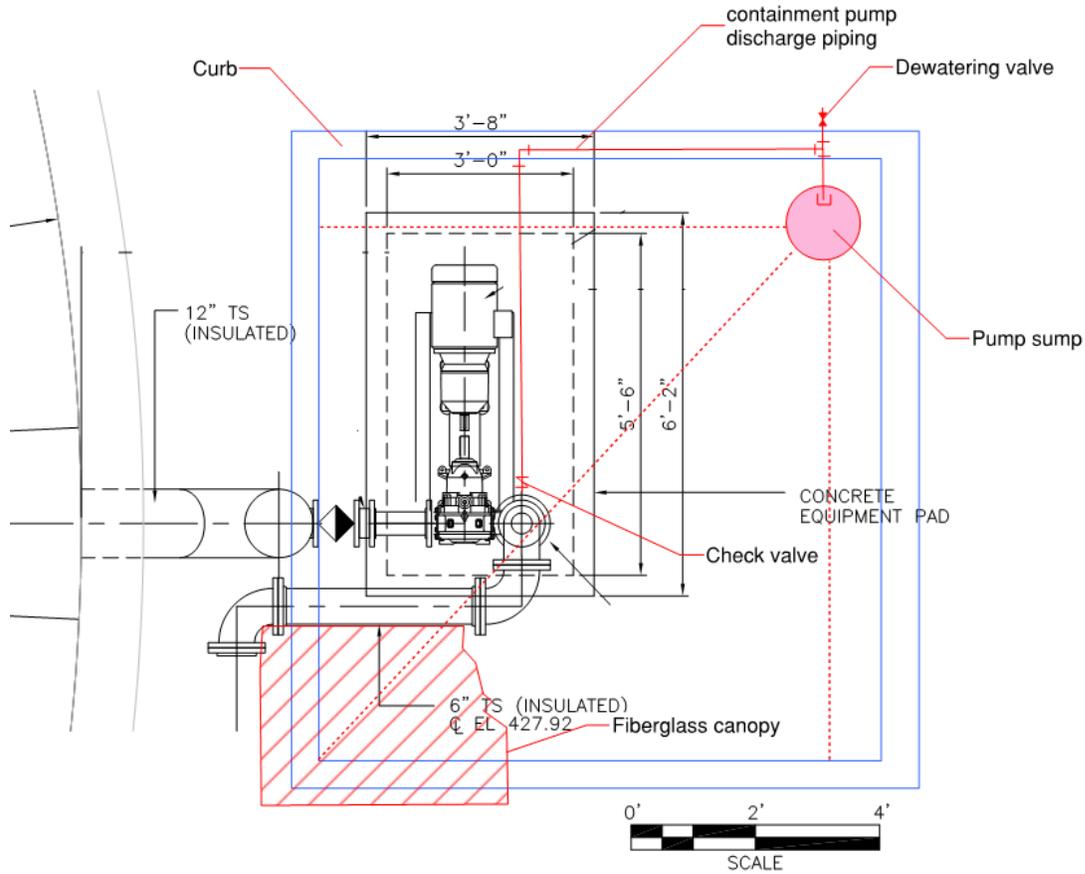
Typical Installation of Thickened Sludge Pump Containment
